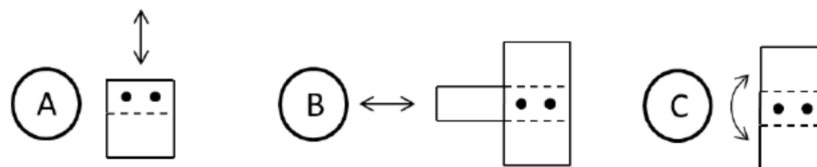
A-Loading perpendicular to joists, B-Loading parallel to joists, C-Rotational loading [24]
